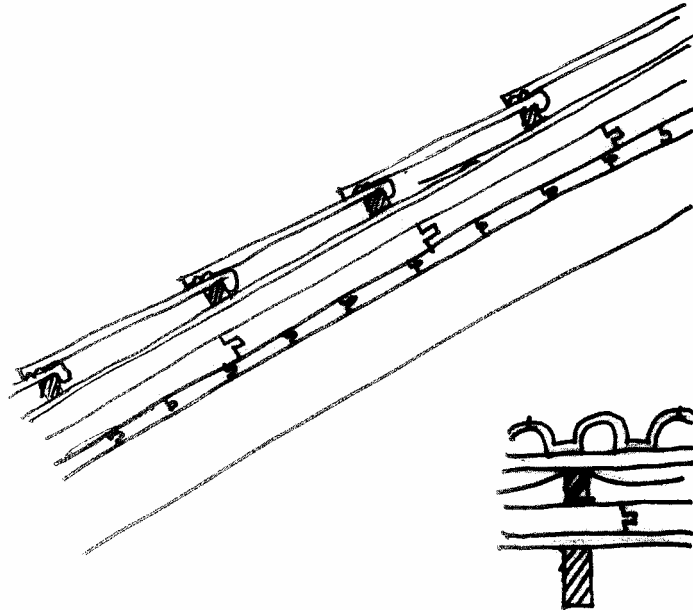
Insulation boards with counter battens and reflective sarking forming air spaces
